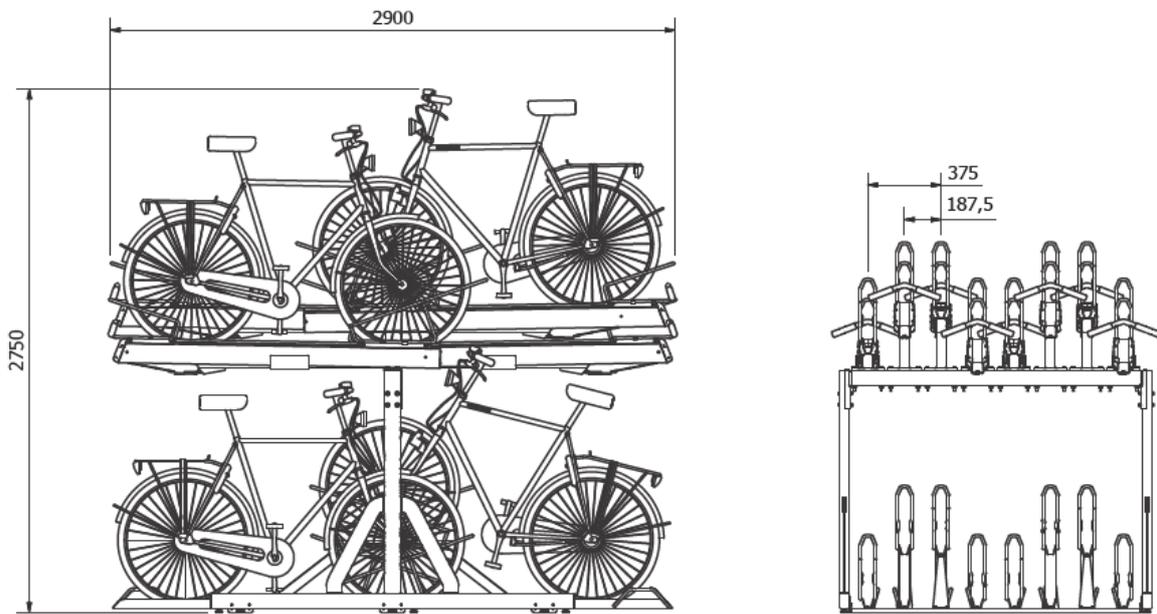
Dimensions of a floor rack with extension rail, double-sided (Falco BV, 2018)
